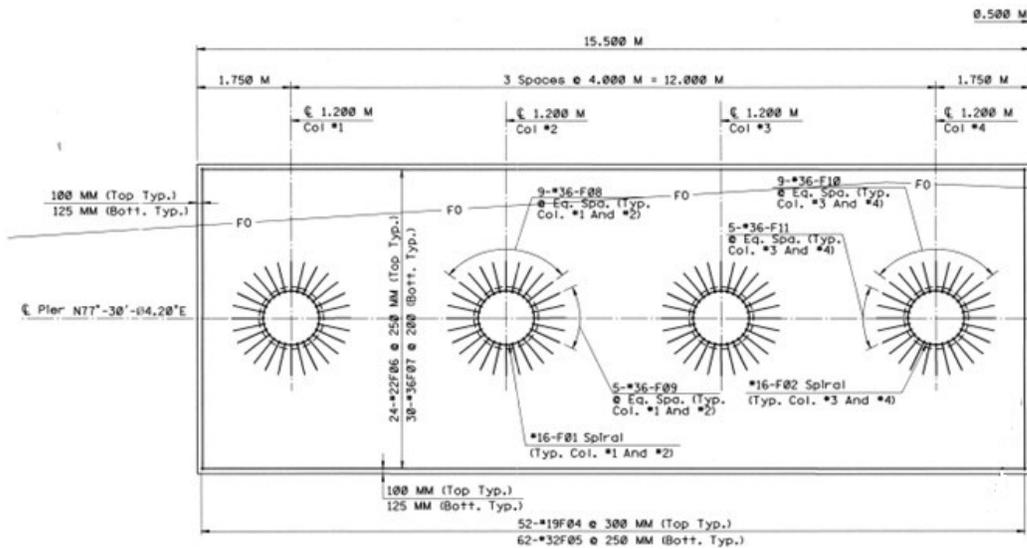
Partial Footing Plan (Left Shown, Right Similar)
